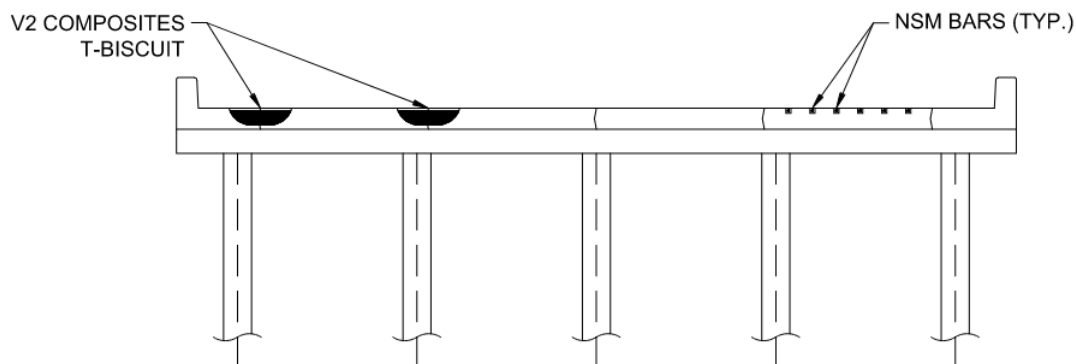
Cross-section of flat-slab bridge retrofits.
